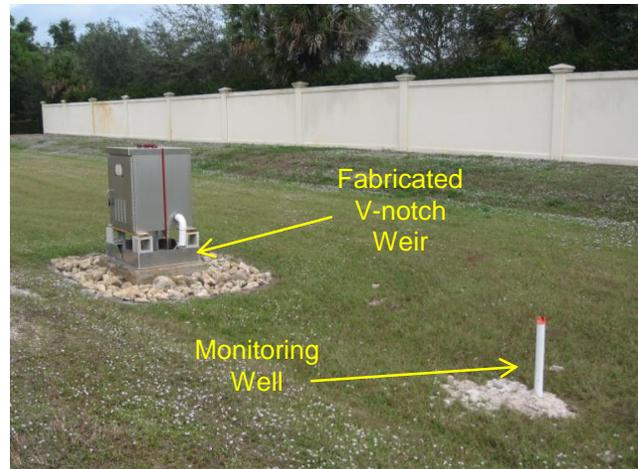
Photographs of Monitoring Equipment Installed at Naples Sites 1 and 2.
